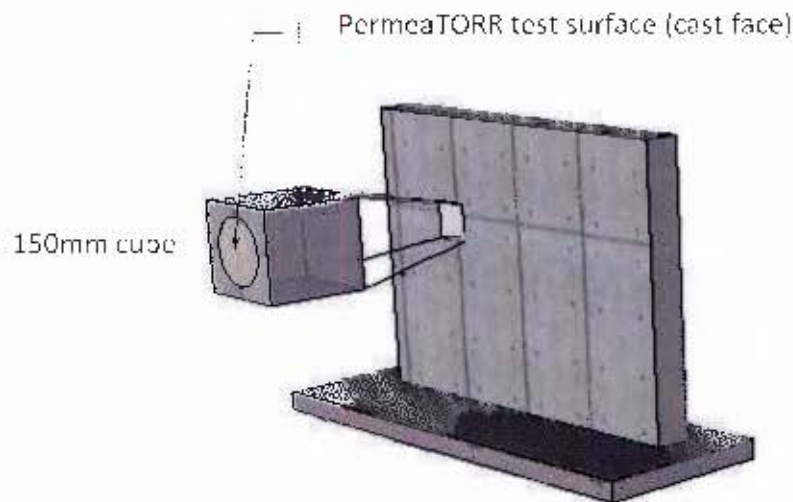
Simulation of a wall section using 150 mm laboratory cubes
